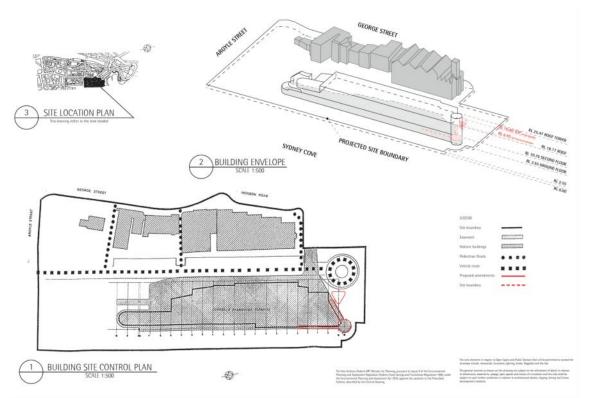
The existing SCRA Scheme Building Site Control Drawing (Source: SSD 7683)
